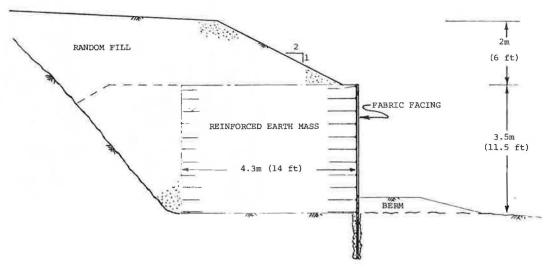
TYPICAL CROSS SECTION, TEST WALL NO.3
